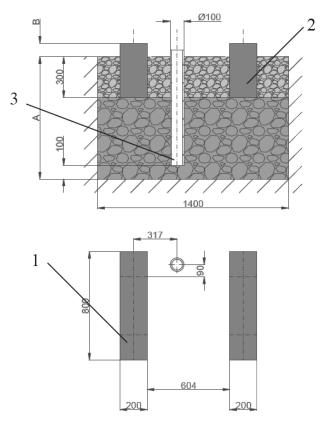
Heat pump foundation – top view 1 - Pad foundation; 2 - Absorbent subbase (gravel, sand); 3 - Condensate drain
